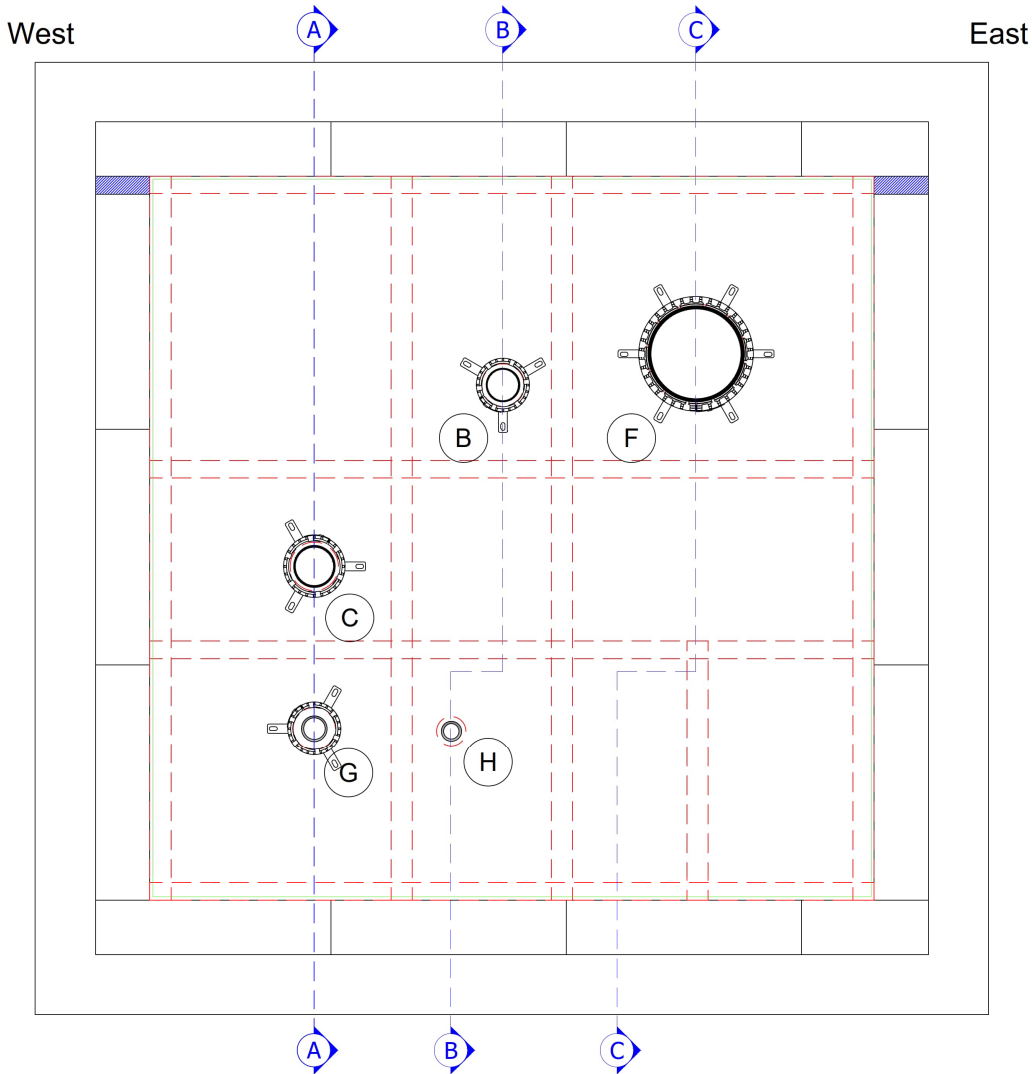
Elevation view of test specimen and their designation (unexposed side)
